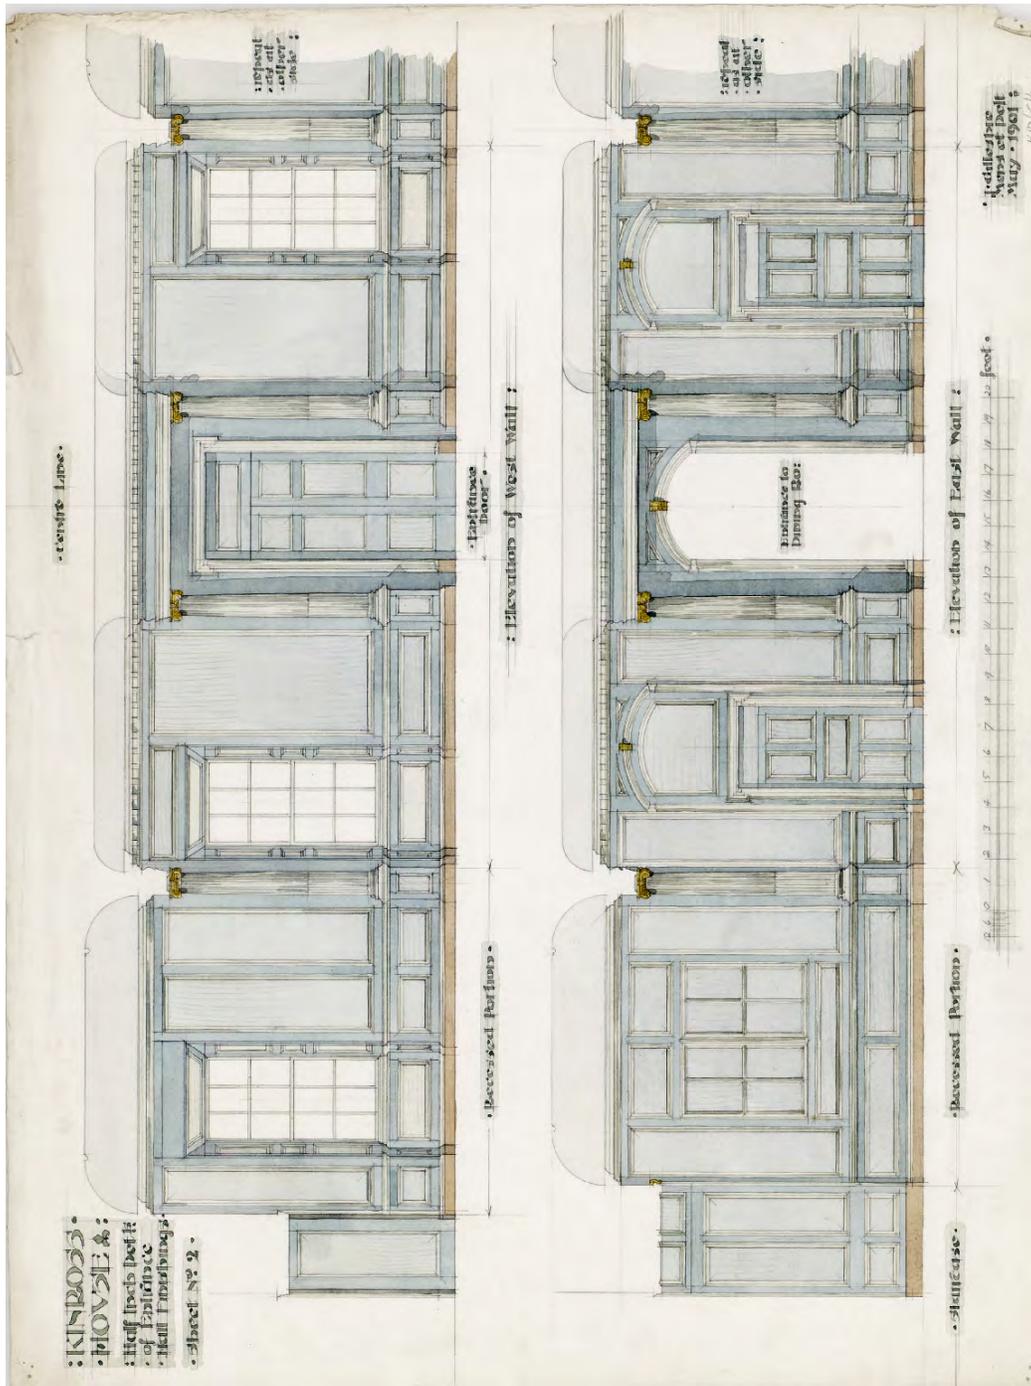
Kinross House hall panelling, presentation drawing sheet 2, pencil and watercolour, J. Gillespie, for Lorimer & Matthew, 1901. NMR
